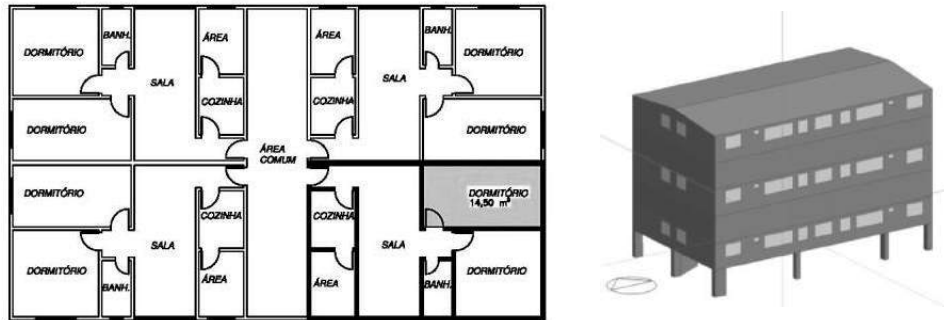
Floor plan and 3D view of the building. Source: *Design Builder* (2015).
